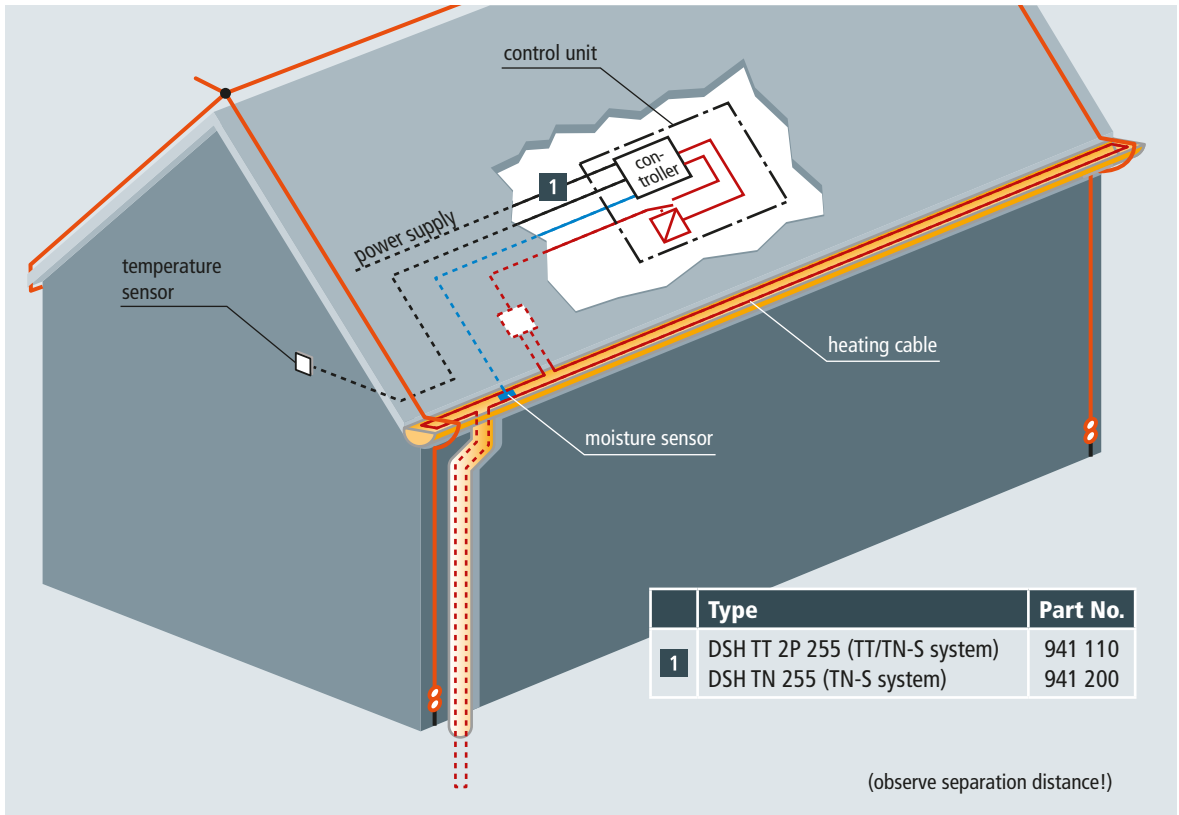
Installation of lightning current arresters if the control unit (loss is accepted) is located near the entry point into a structure with external lightning protection
